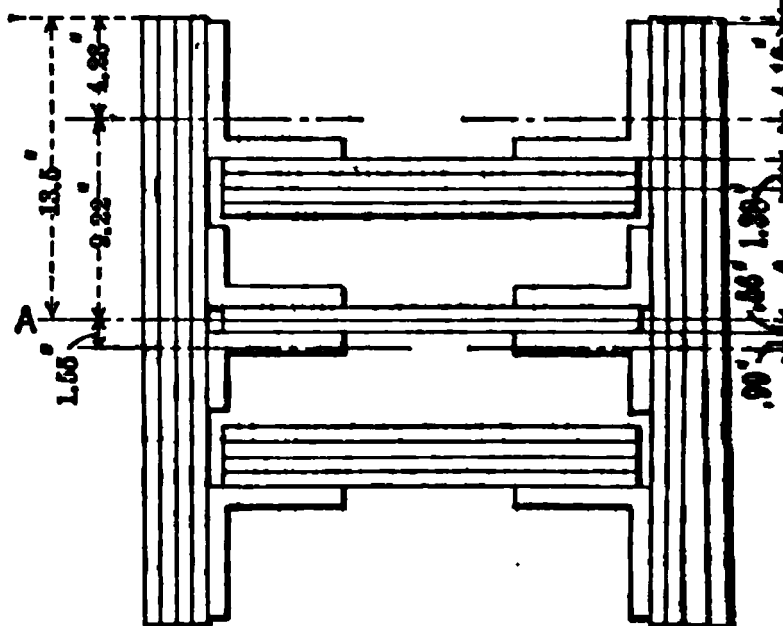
Moment of Inertia of Cross-section of Web Plate-and-angle Box Column
